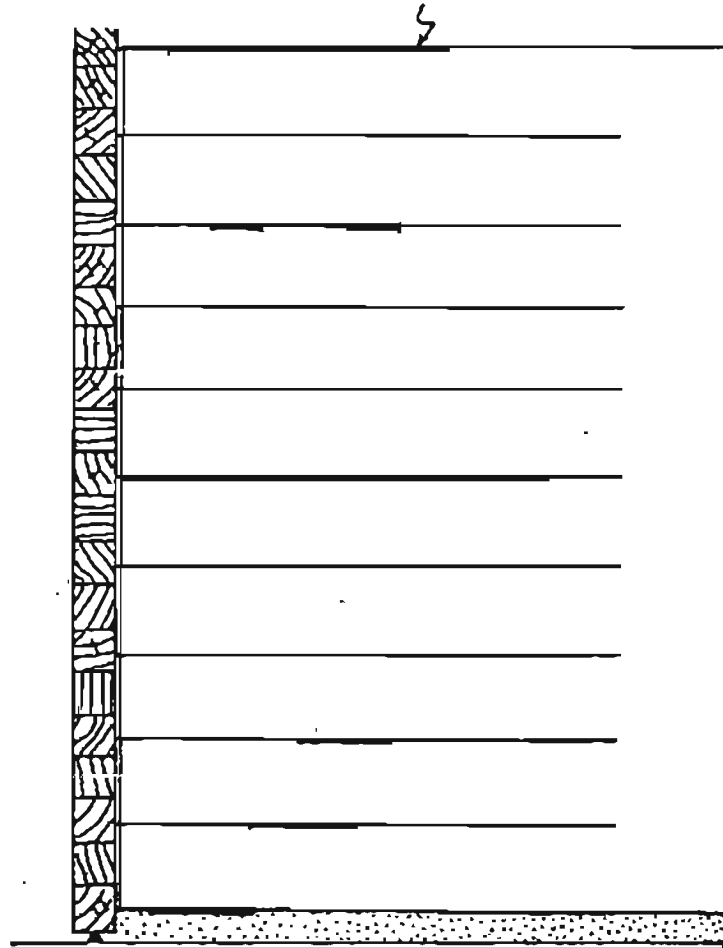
Predicted Failure Condition, Cohesive Backfill Test Wall
